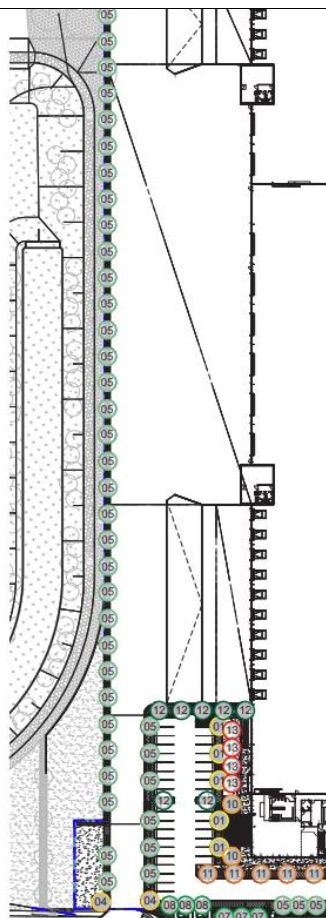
Applicant's Landscape plan – Warehouse 1 – 05 refers to Spotted Gums
